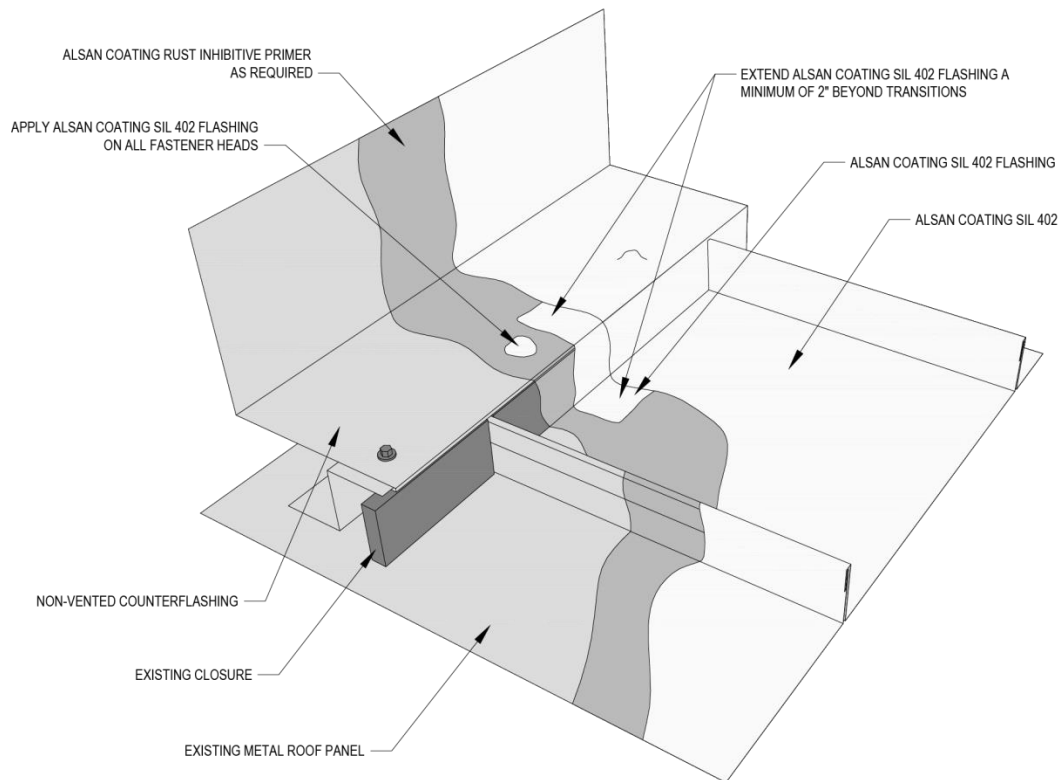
Silicone Roof Coating Over Standing Seam Metal, Wall/Curb
